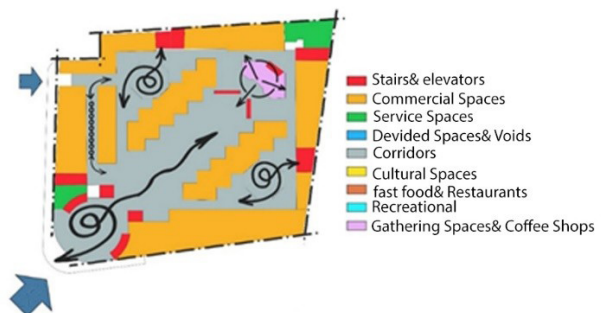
Schematic plan of the ground floor of Tiraje. Authors.
